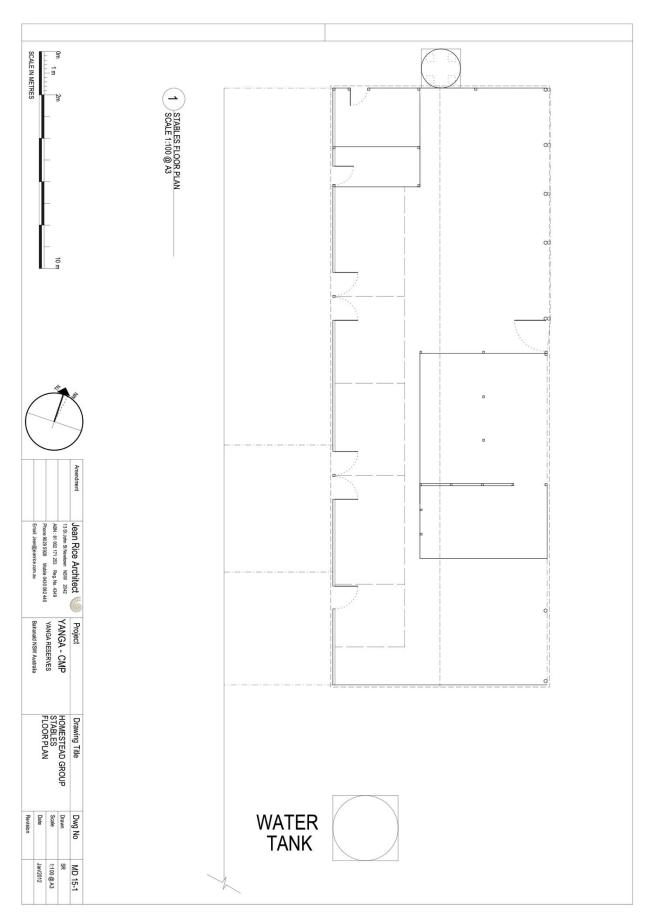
Homestead Group Stables floor plan.. Jean Rice Architect, site assessment 2009.
